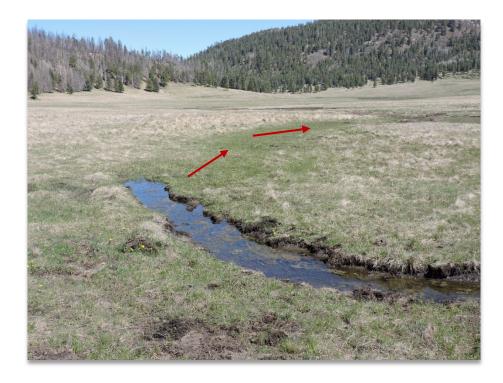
A contour swale that was constructed in Summer 2015 in conjunction with a plug and pond structure to re-route flow out of an incised channel at Site 37. Precipitation filled the swale and it is rewetting the area downslope (September 2016).
